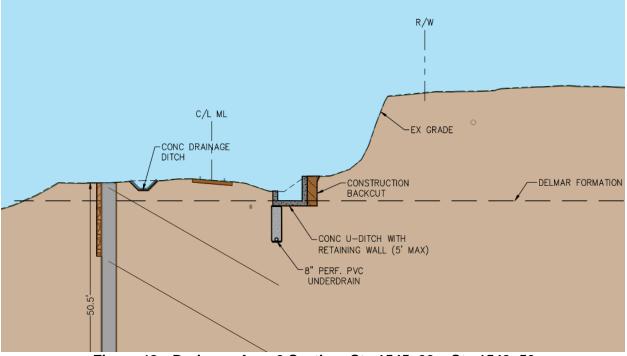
Drainage Area 2 Section: Sta 1545+00 – Sta 1548+50
